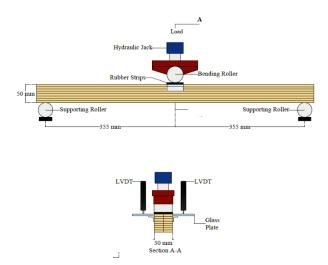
Specimen dimensions and set up of static bending test (units in mm)
